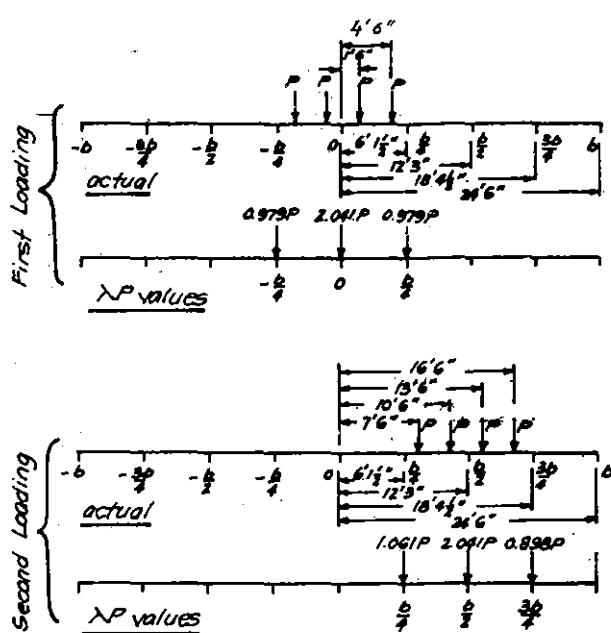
Transverse dispositions of loading vehicle on beam and slab bridge
